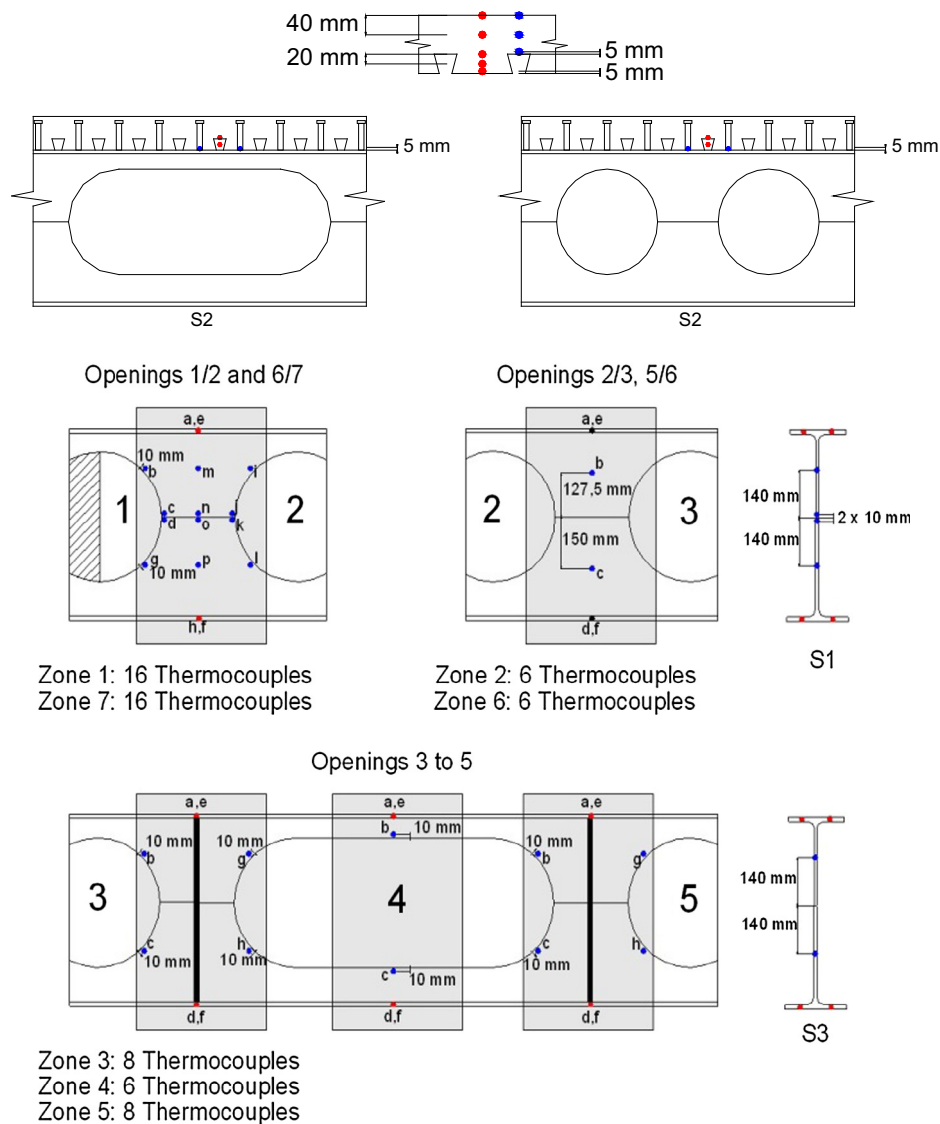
Typical thermocouple positions in cellular tested beams and concrete slab cross-sections.
